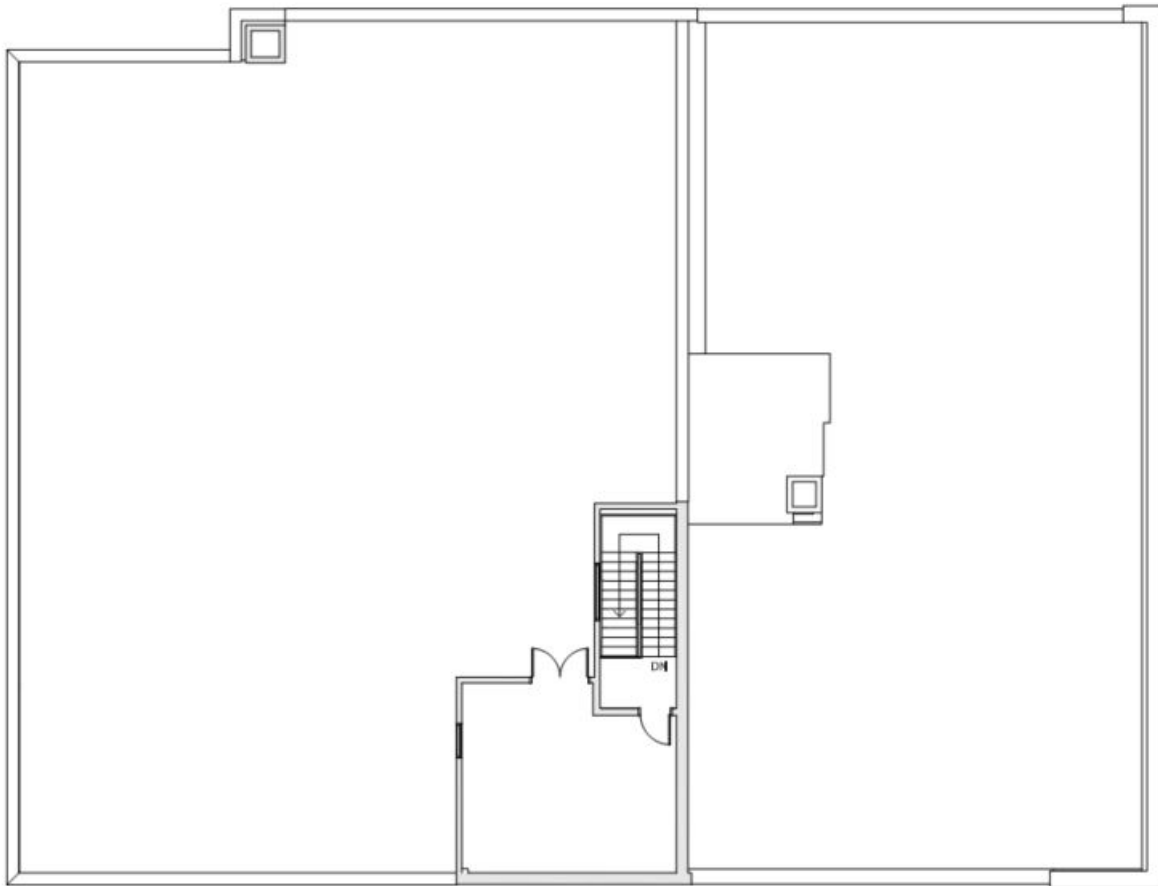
Roof Photographic Key Plan. Alley Poyner Macchietto Architecture, Omaha, Nebraska, 2021
